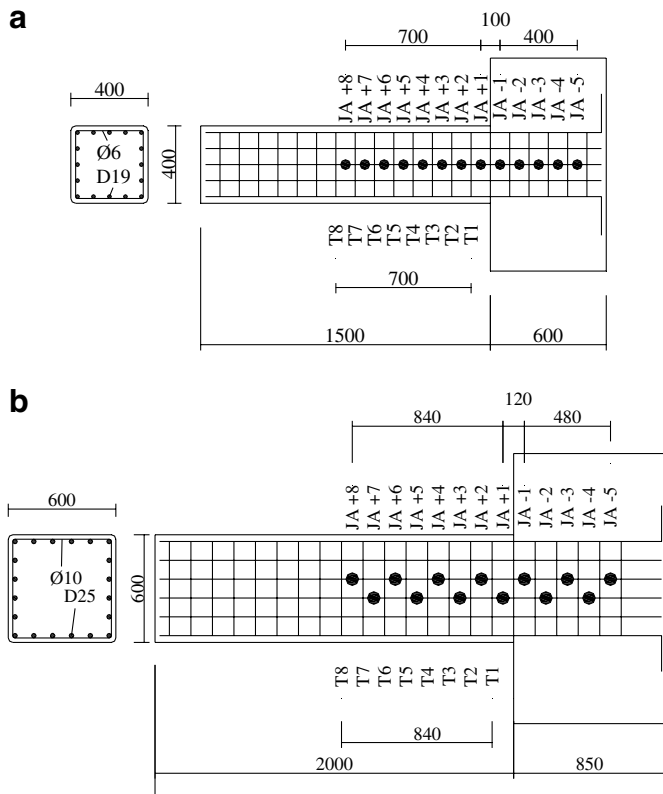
Arrangement of reinforcements. (a) 400 × 400 mm specimen, (b) 600 × 600 mm specimen.
